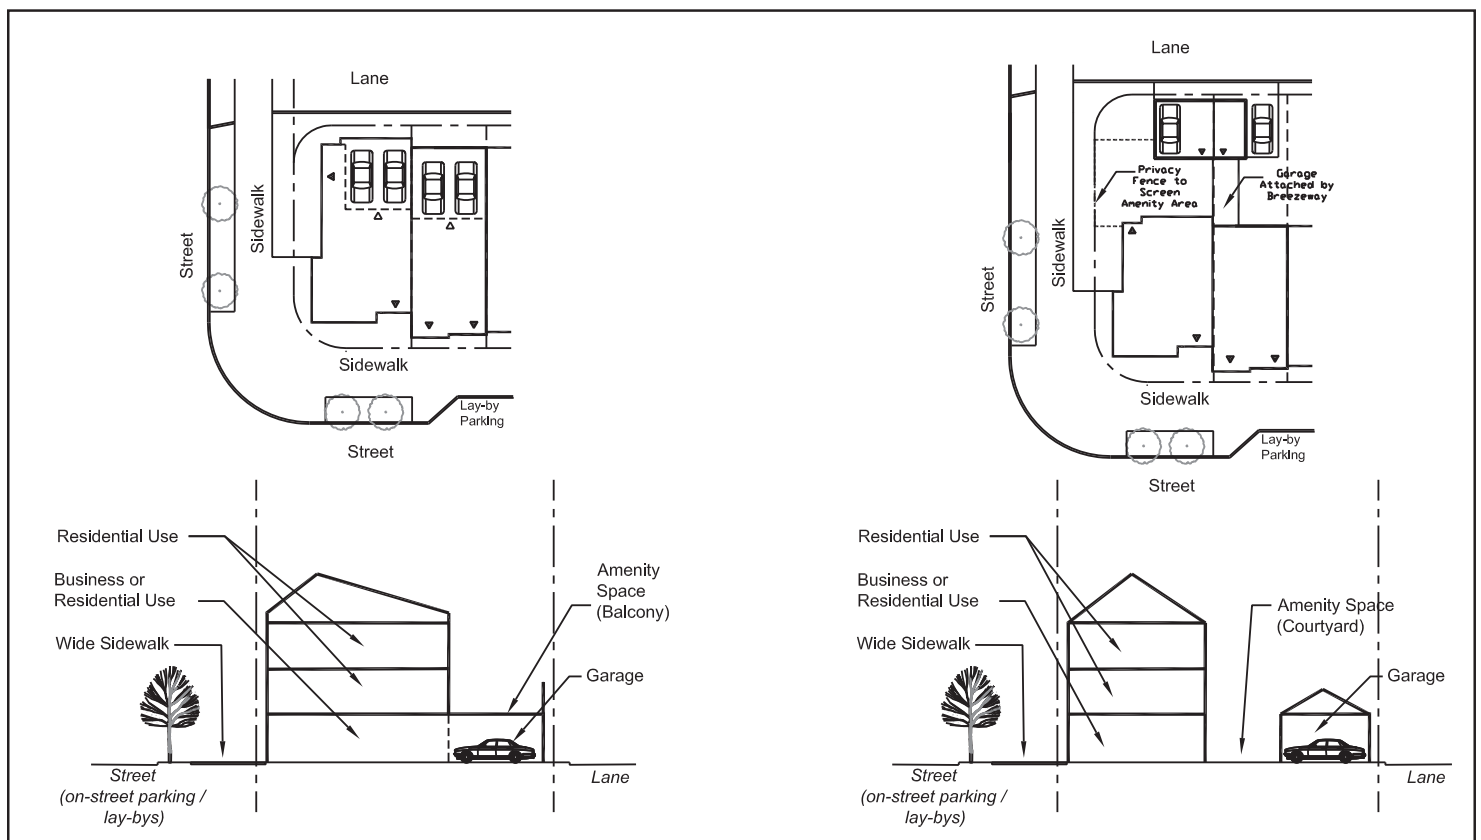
Conceptual Plan View and Cross-Section of Live-Work Townhouses
